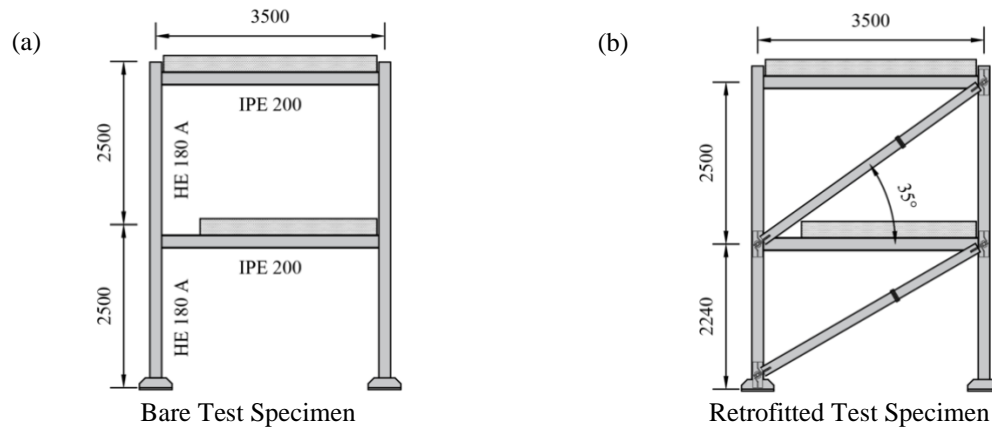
Schematic view of the (a) bare and (b) retrofitted test specimens [units in mm].
